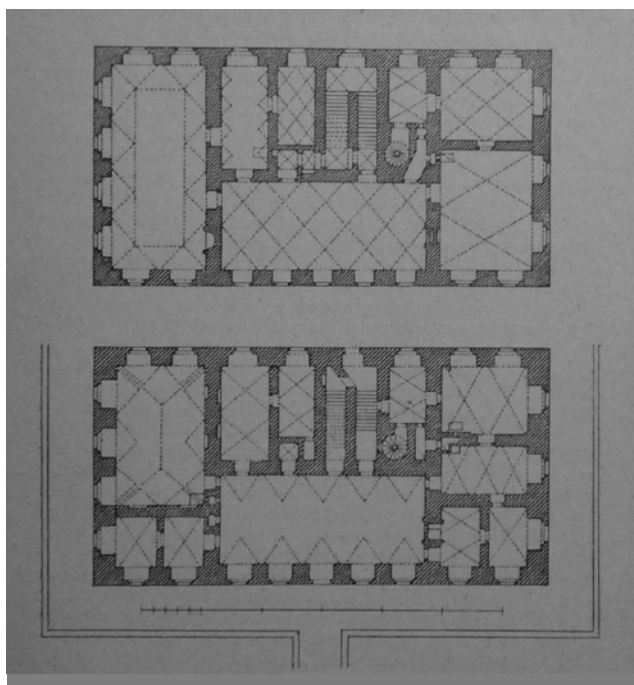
Ground plans of the main floor (bottom) and the second floor (top) of the central villa.
